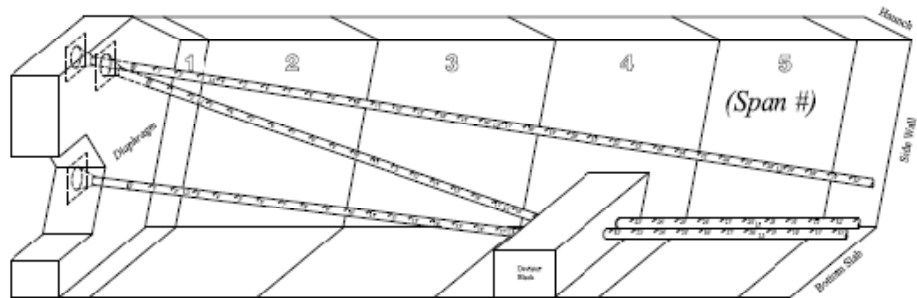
An Isometric Interior View of a Bridge Girder (after Surveying).
